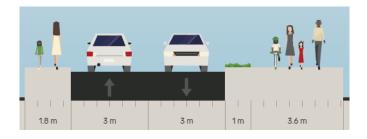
Slí Ógie Uí Dhufaigh street cross section
